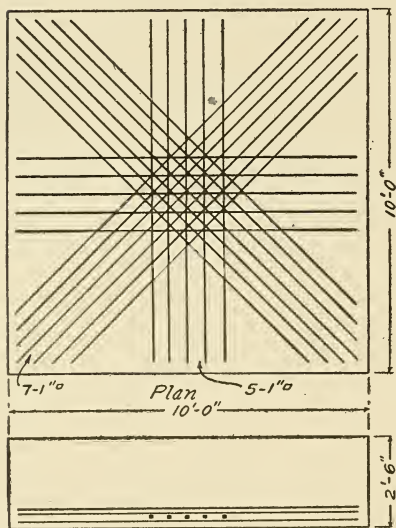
Interior Column Footing for Buck Building, Philadelphia, Pa.
